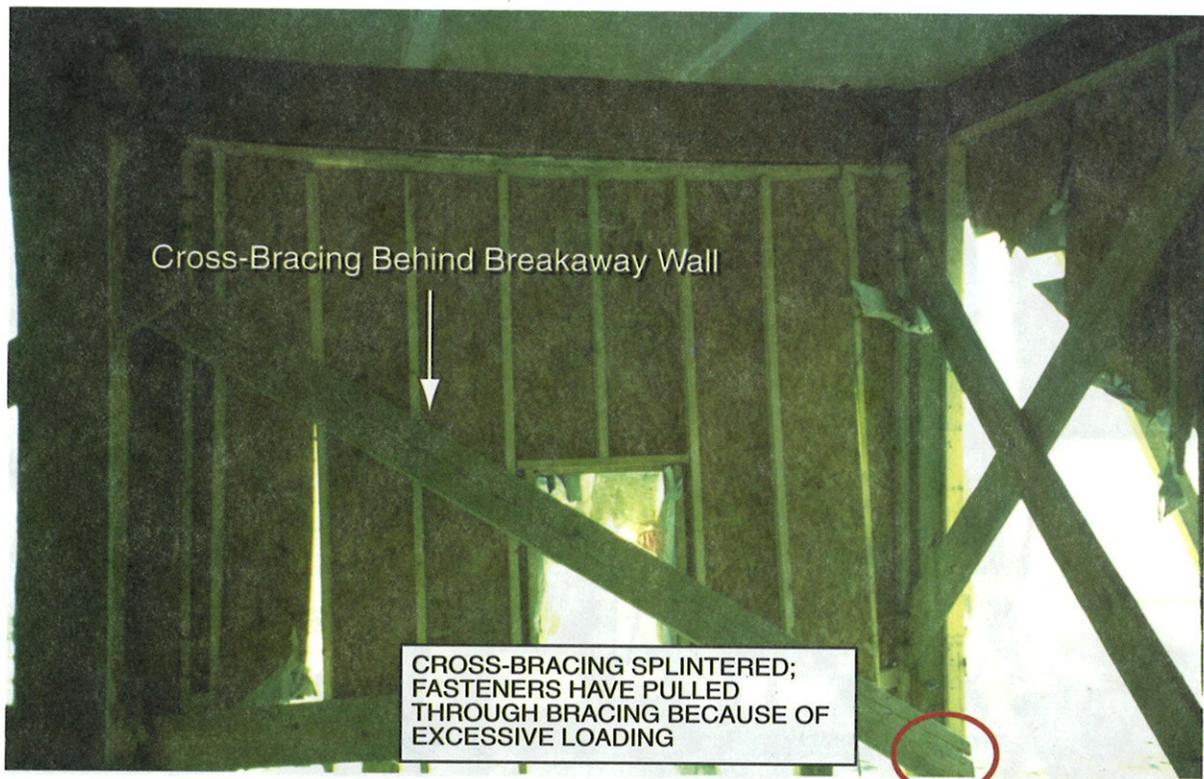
Improper installation of breakaway walls (on the seaward side of cross-bracing) resulted in failure of cross-bracing. Note breakaway wall pushed against cross-bracing.
